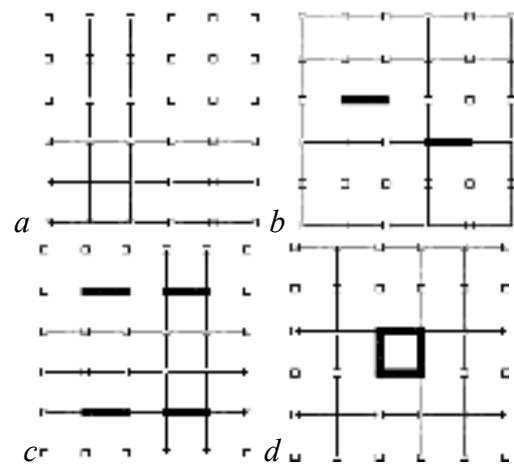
Layouts of multi-storey buildings with a hybrid structure: a) without rigidity elements; b) 2 shear walls; c) 4 shear walls; d) rigidity core
